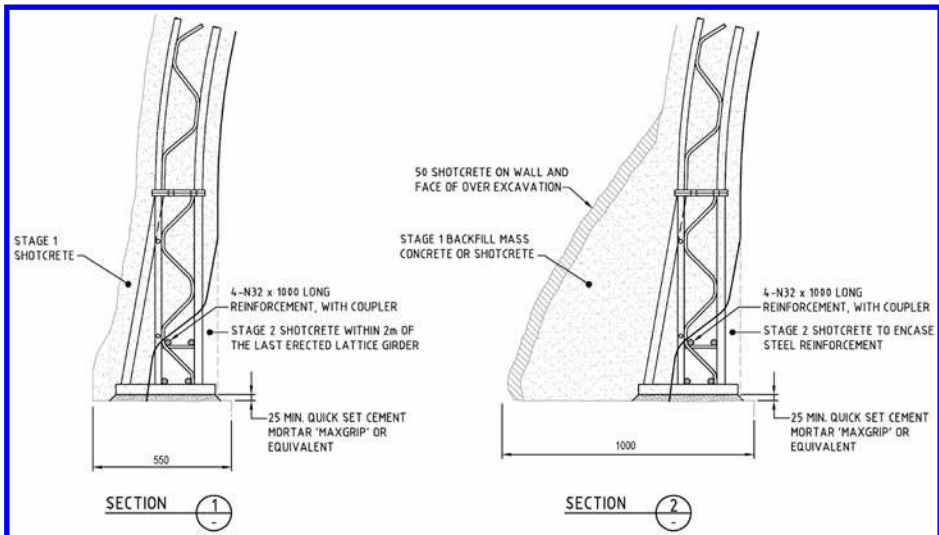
The standard shotcrete and alternative wider footing/wall beam for highly weathered claystone.
